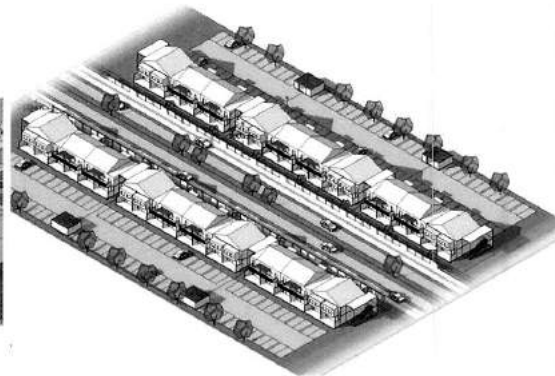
Sketches reflecting the section and arial view of the proposed Boulevard Edge Block units
